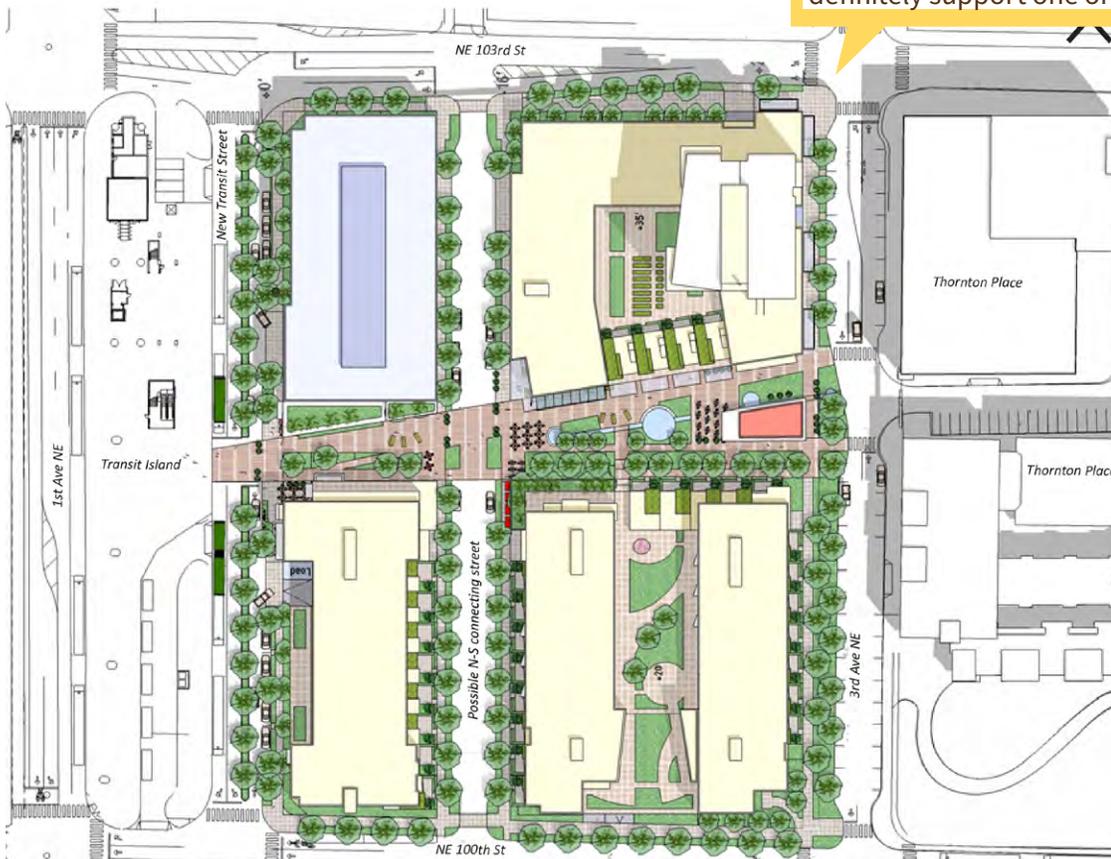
Public Plaza Illustrative Site Plan, 2013 Northgate Urban Design Framework
